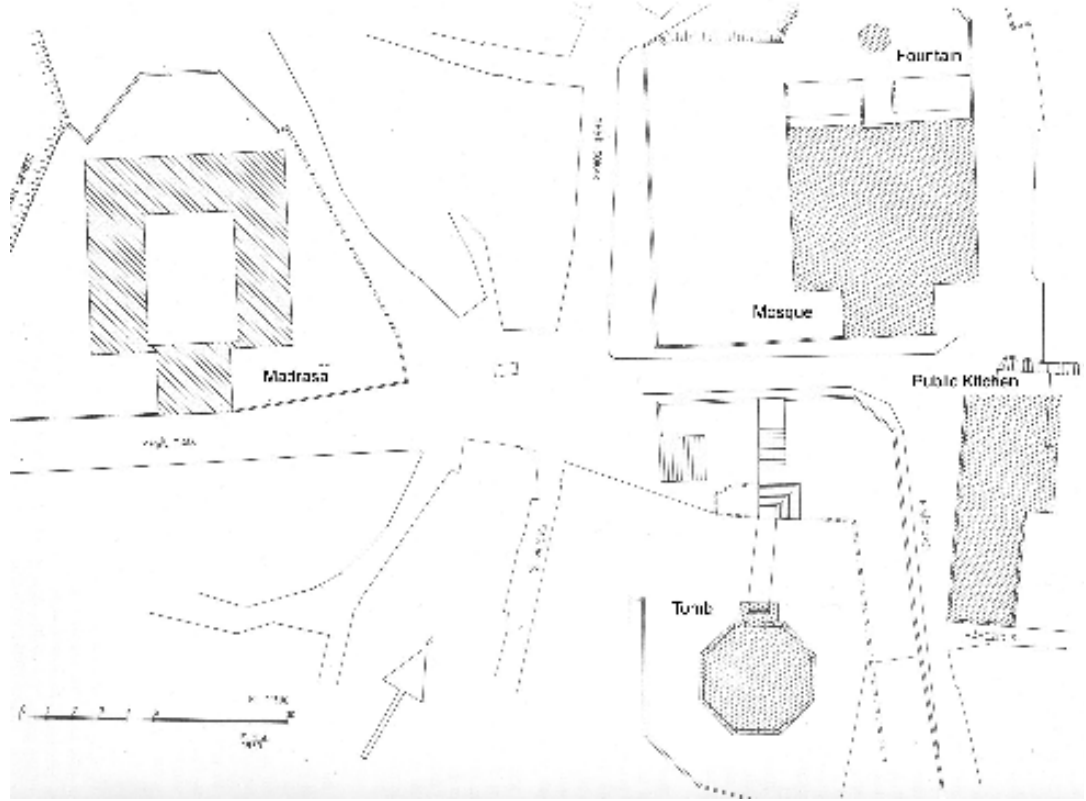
1 Site Plan of Yeşil Külliye in Bursa (1414-1424)
